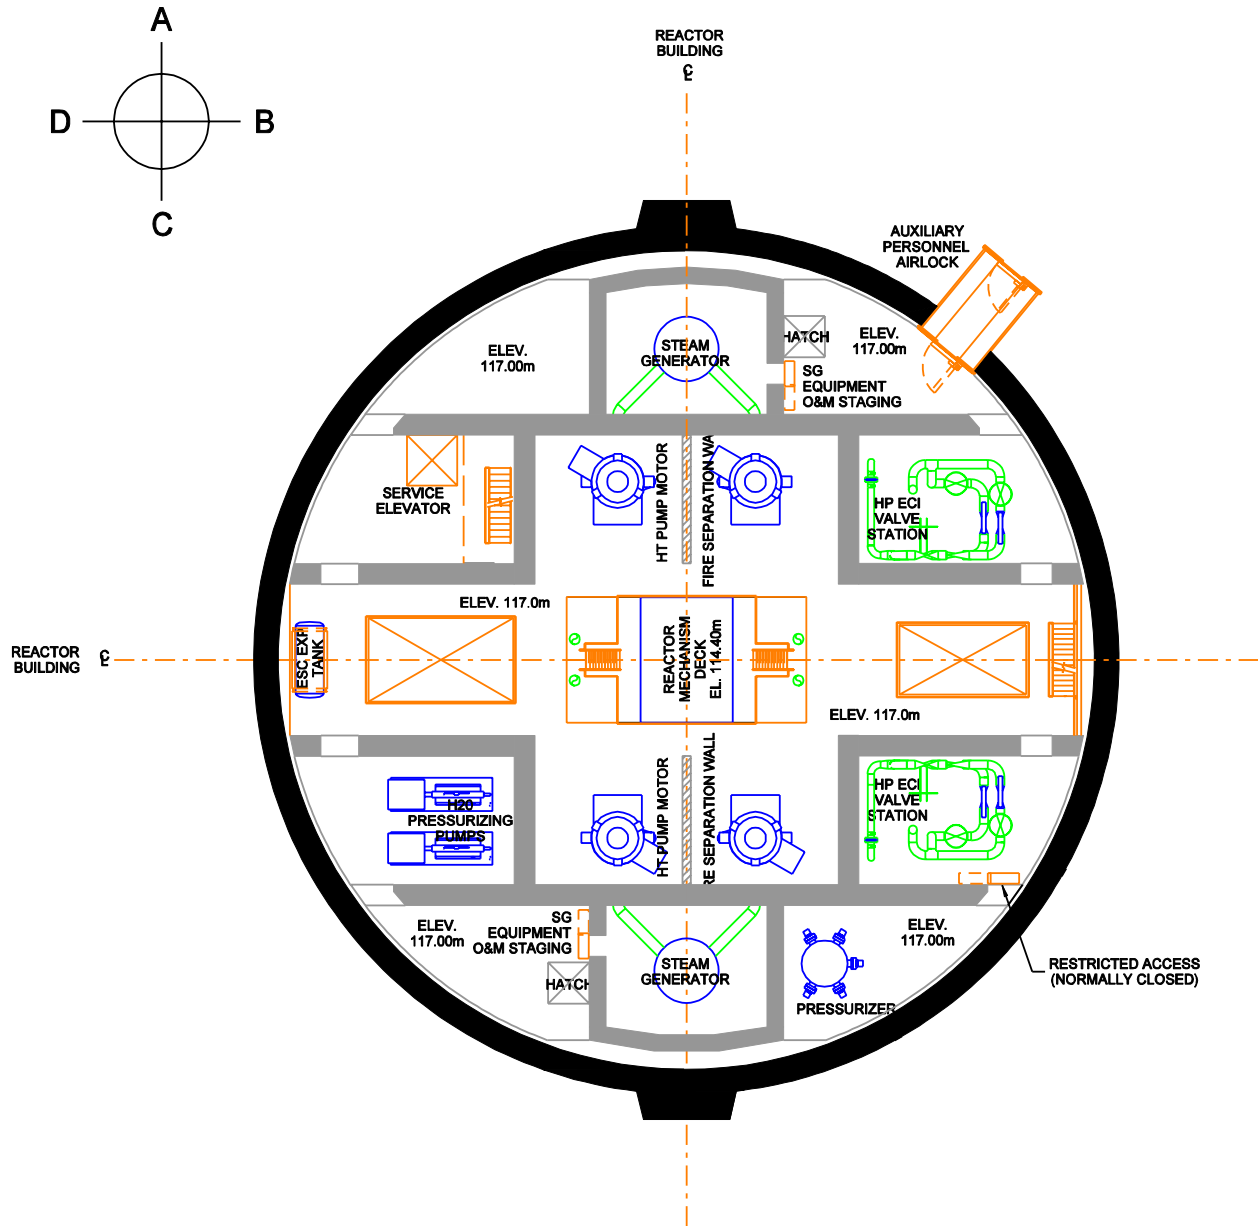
ACR-700 Reactor Building - Plan @ Elevation 116.4
